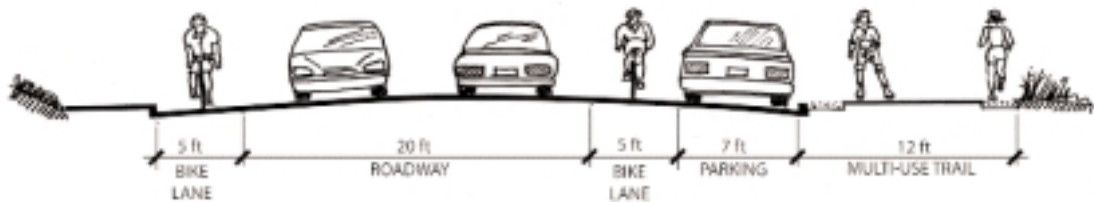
Proposed Development of Bay Area Ridge Trail at Washington Boulevard
